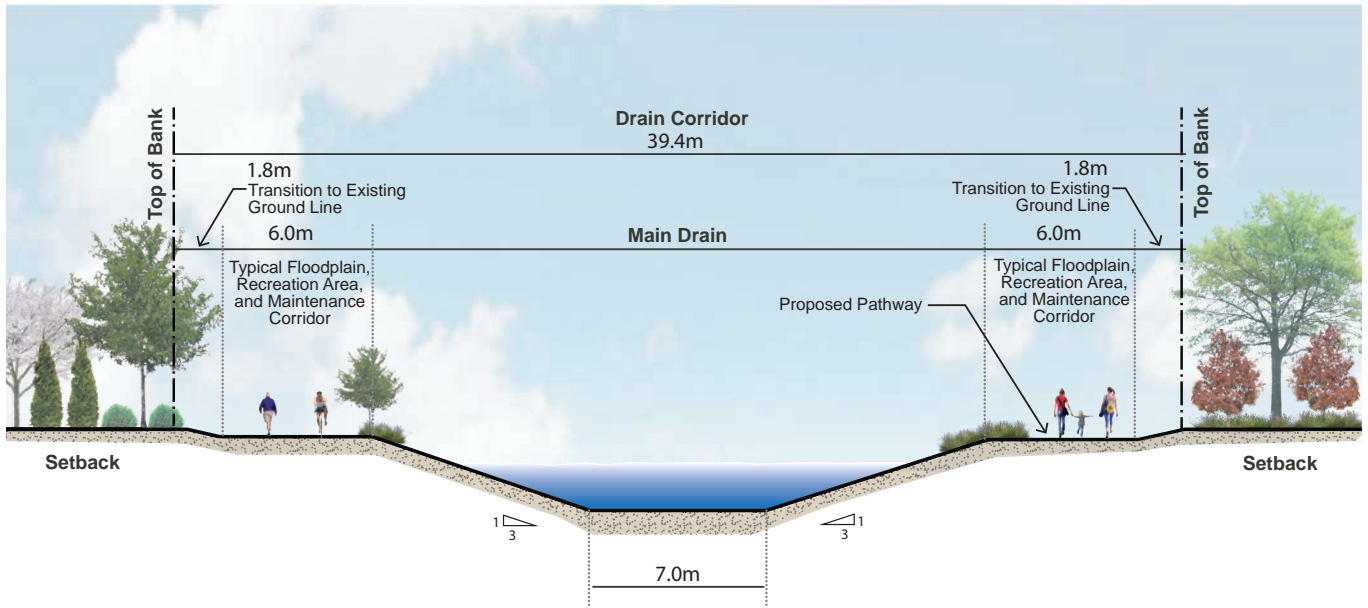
Typical north-south drain cross section as proposed in the Master Drainage Study Report - Howard/Bouffard Planning Area.
